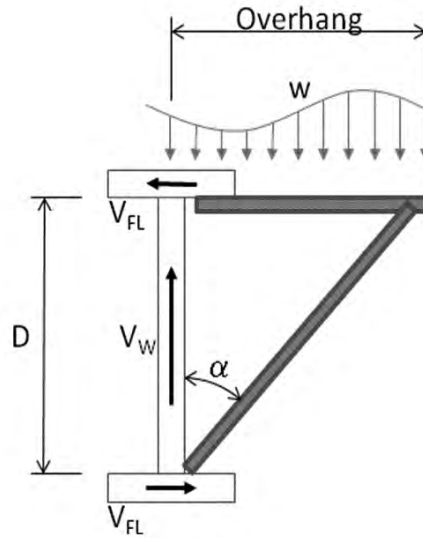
Typical overhang falsework bracket (courtesy Dayton Superior).
